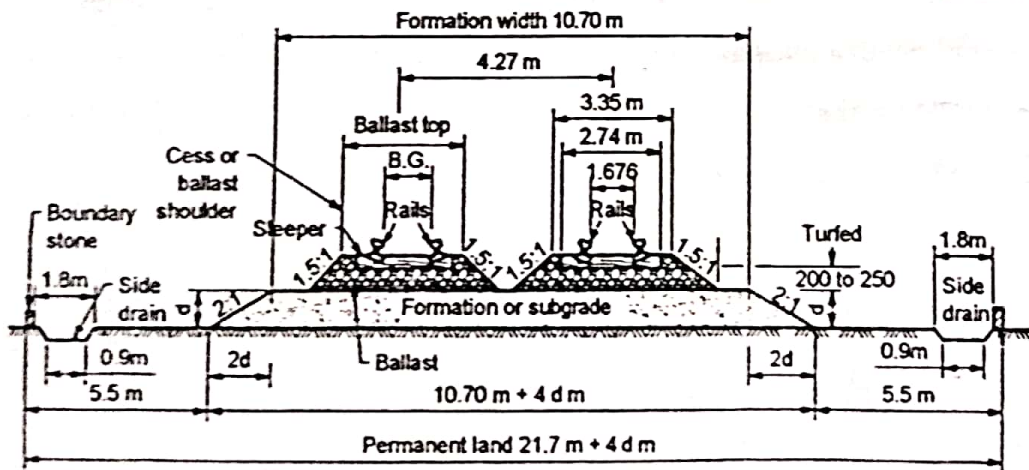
Cross-section of a double broad gauge track in embankment
